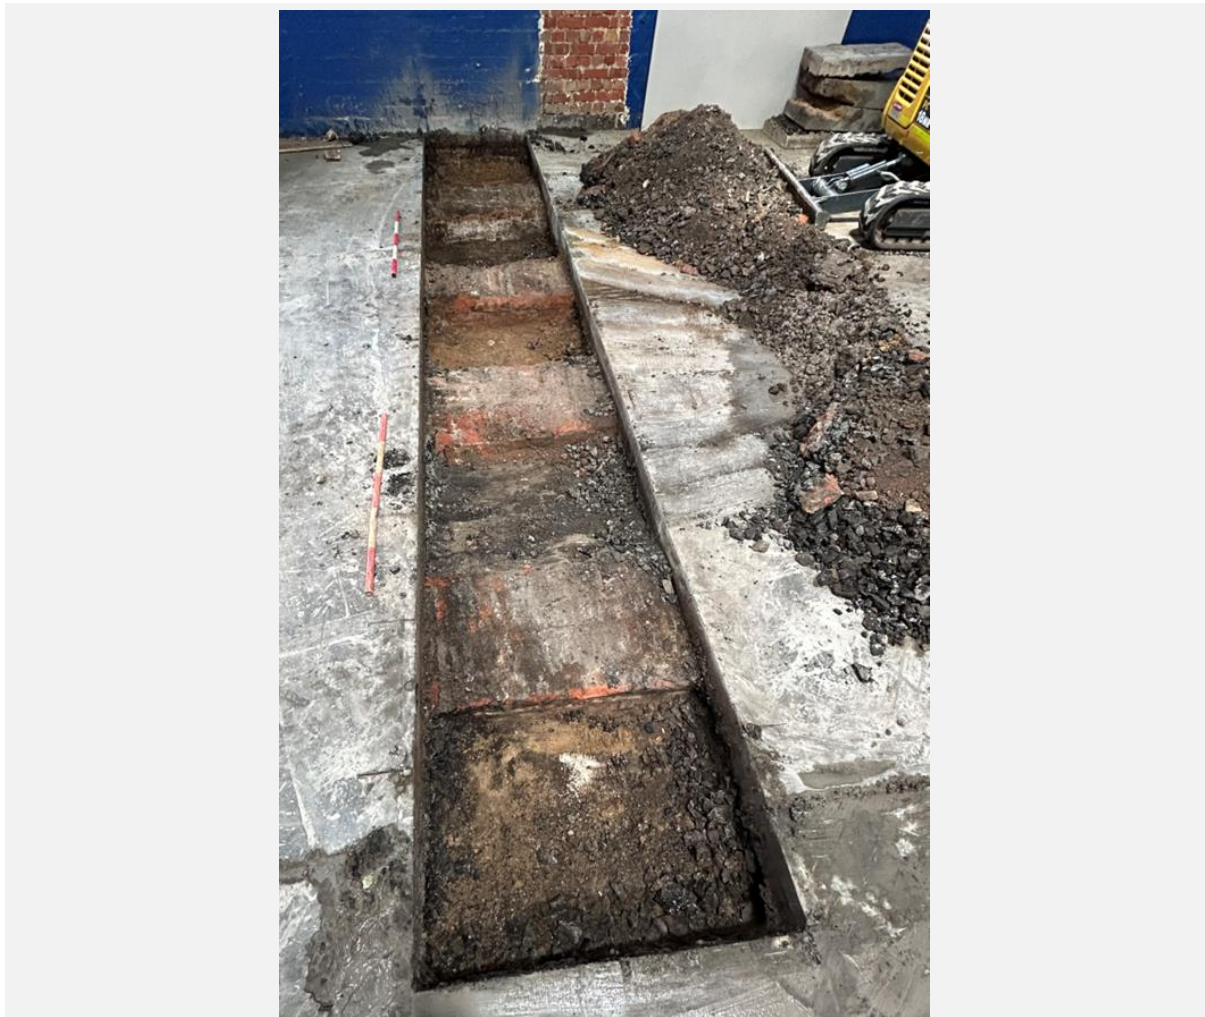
Overview of Trench 1 post removal of concrete and bitumen <1000> with tops of brick walls for cable pits exposed. View to the south.
